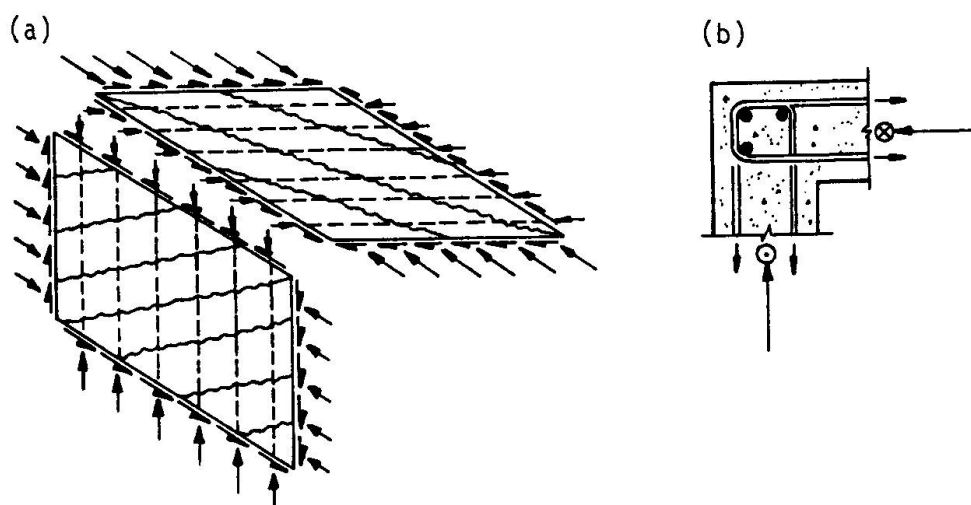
Connection of wall elements: (a) Force flow; (b) Detailing of transverse reinforcement.
